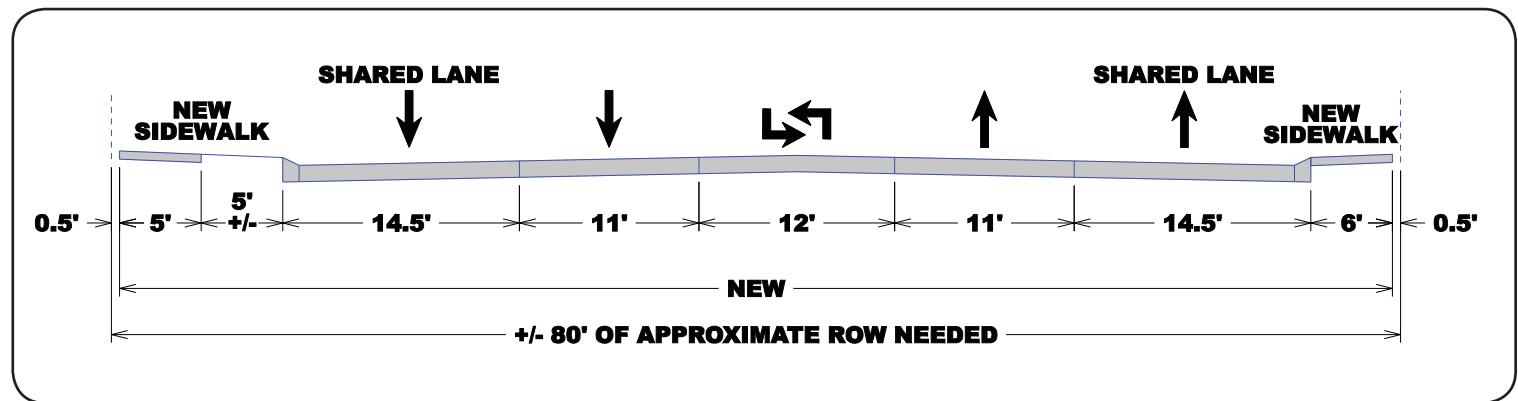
B. PENNSYLVANIA AVENUE PROPOSED CROSS SECTION FROM NW ARTERIAL TO HEMPSTEAD HIGH SCHOOL
